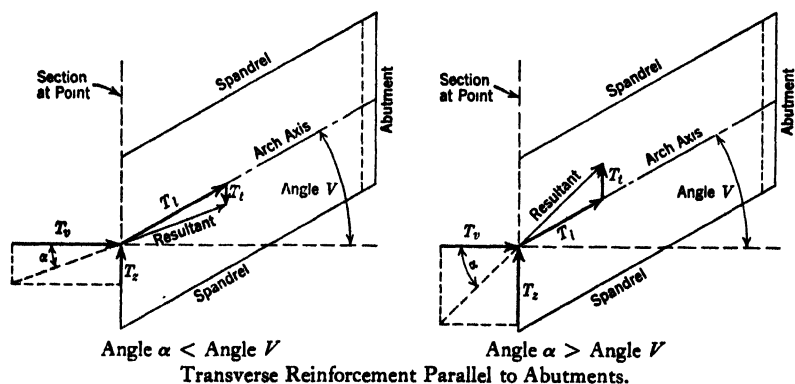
Transformation of Forces Acting on Cut Section as Calculated, to Forces Acting in Directions Desired for Design of Reinforcement.
